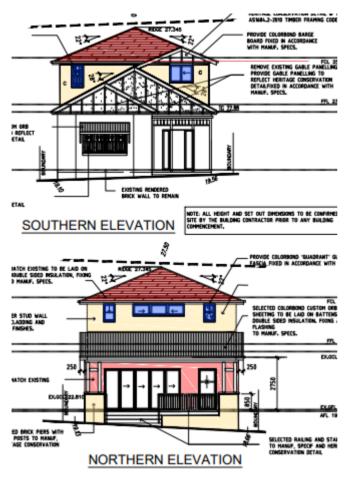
View of front and rear elevations of the proposed alterations and additions (source: Fedele Design P/L)
